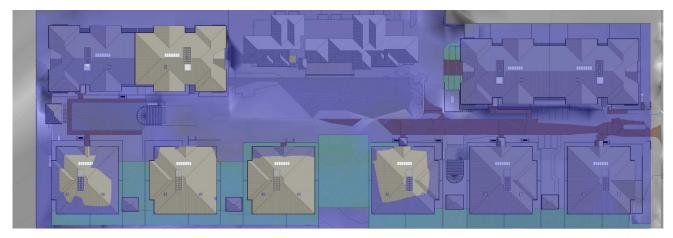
Proposed development plan overlayed with 12m height plane (blue) from the existing ground level (as per the 2017 survey)
